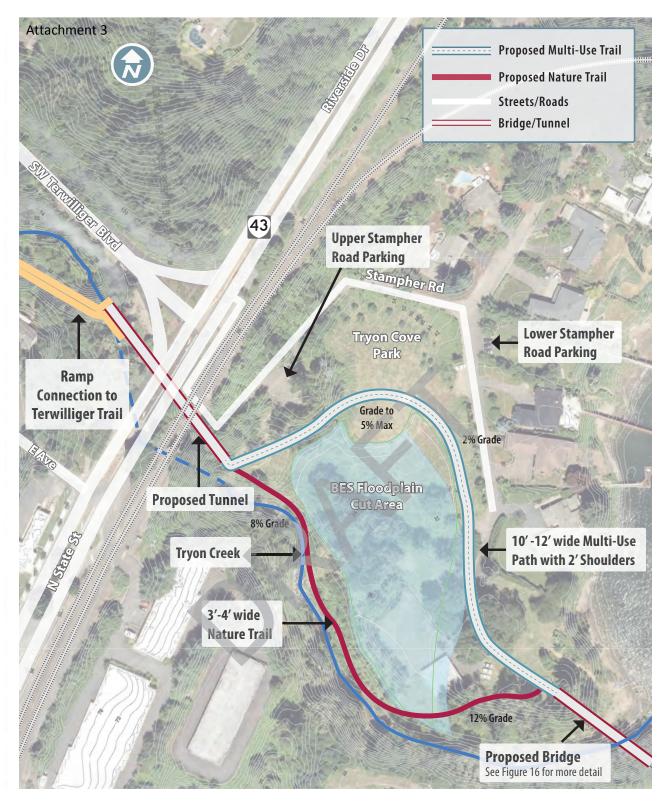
HIGHWAY/RAIL TUNNEL UNDERCROSSING
